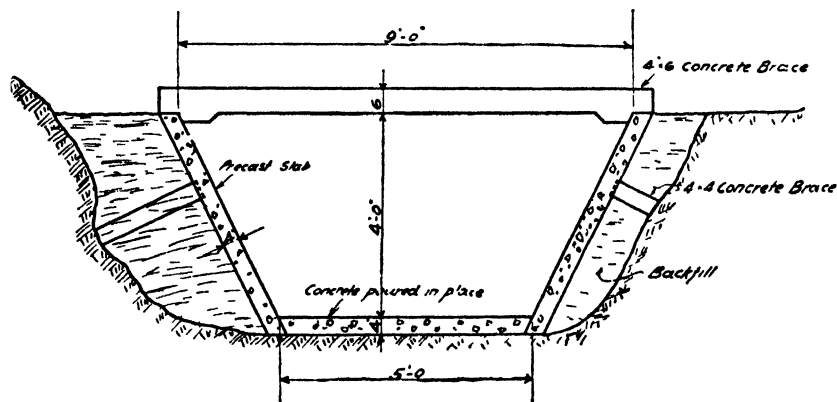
SETTING CONCRETE SLABS IN PLACE IN FLOWING DITCH.
